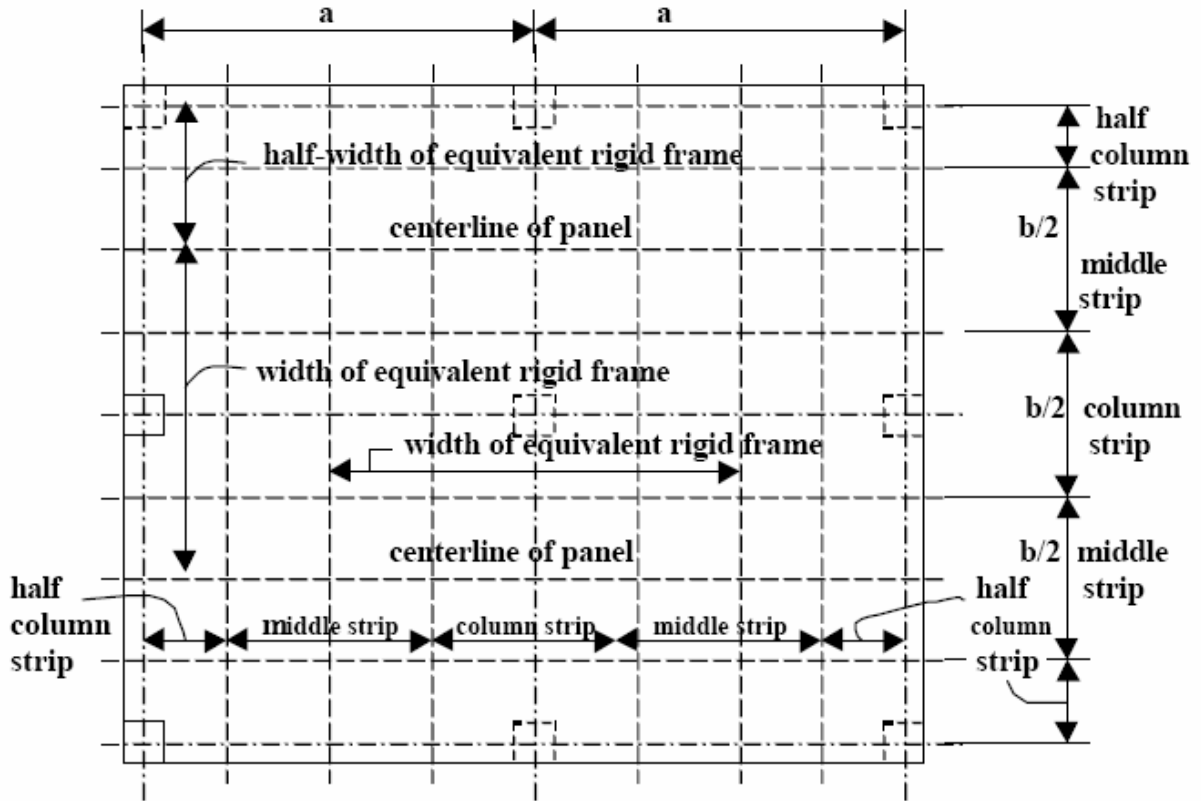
Plan of flat slab without beam grid for vertical loading
